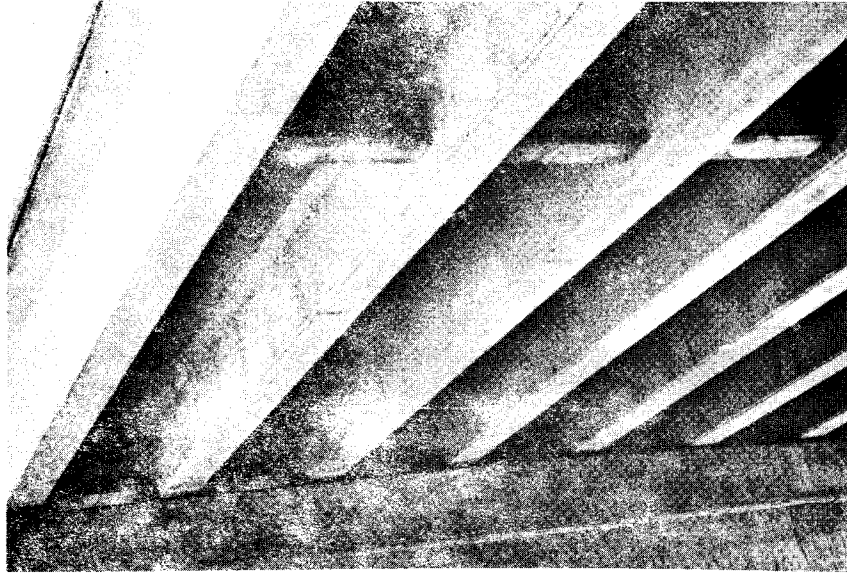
Site-cast concrete diaphragms between the precast tee beams.
